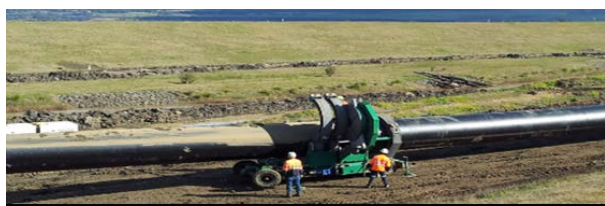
Field butt welding of 1,600 mm diameter pipes for river diversion
